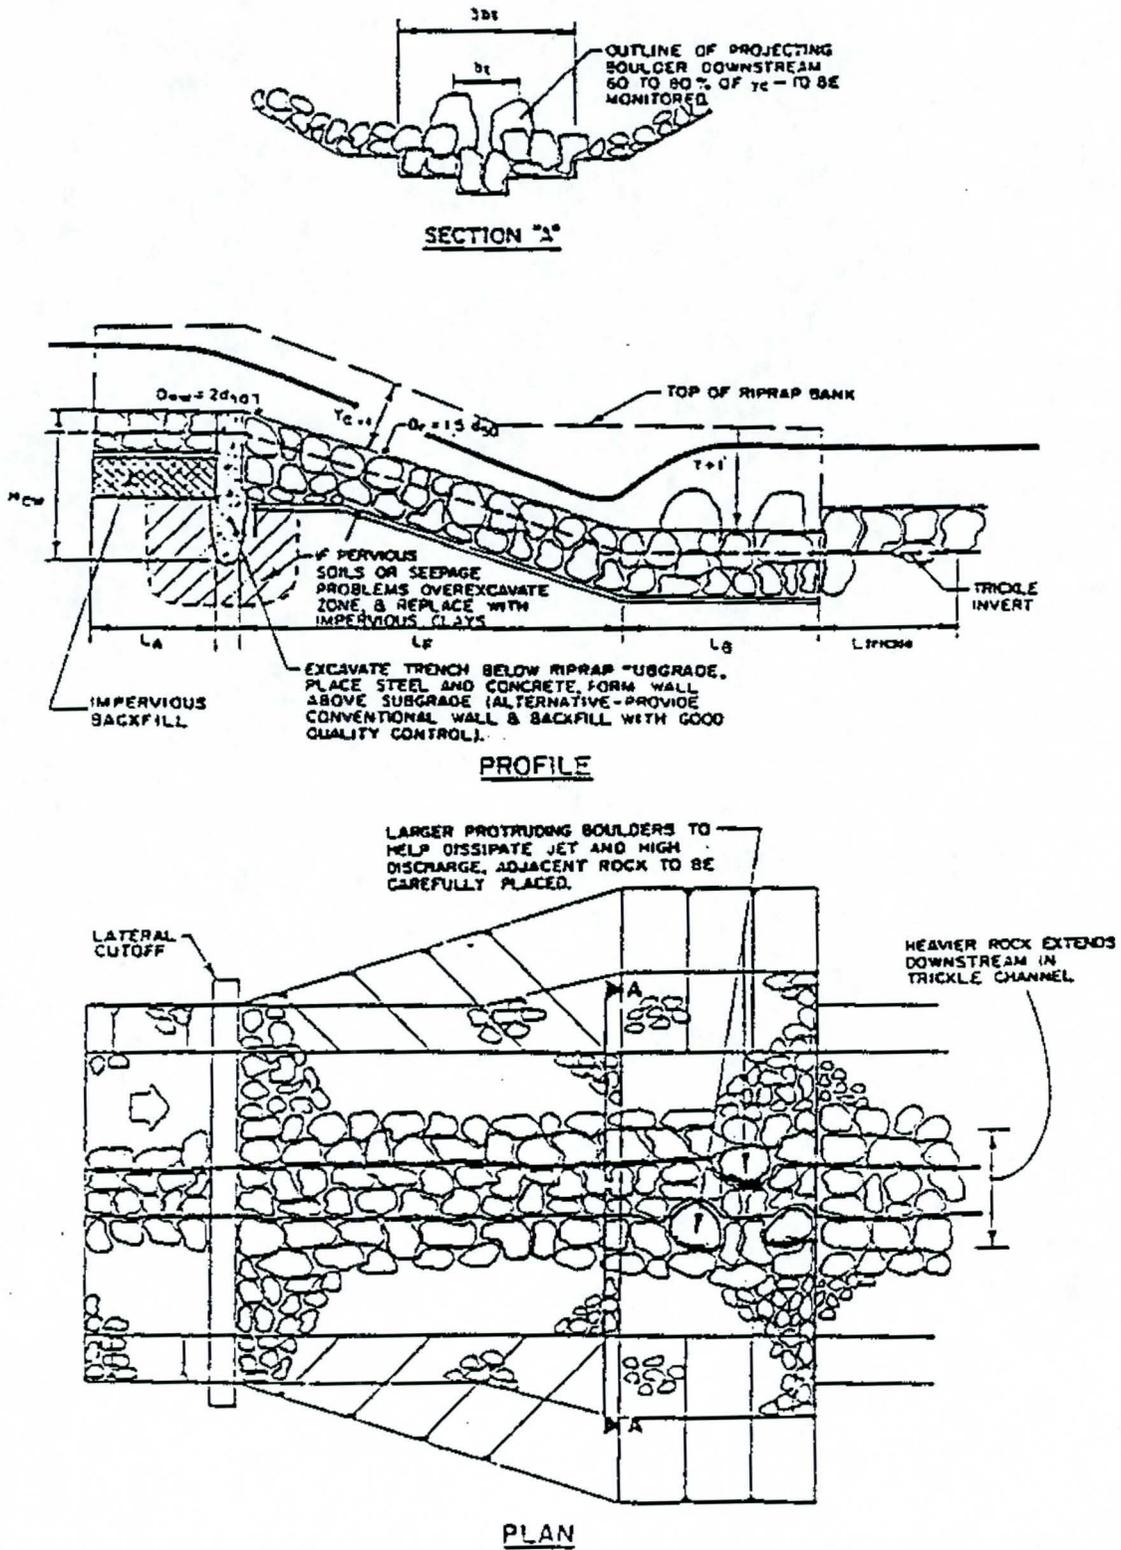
Sloping drop grade control structure with pre-formed riprap lined scour (from McLaughlin Water Engineers 1986).
